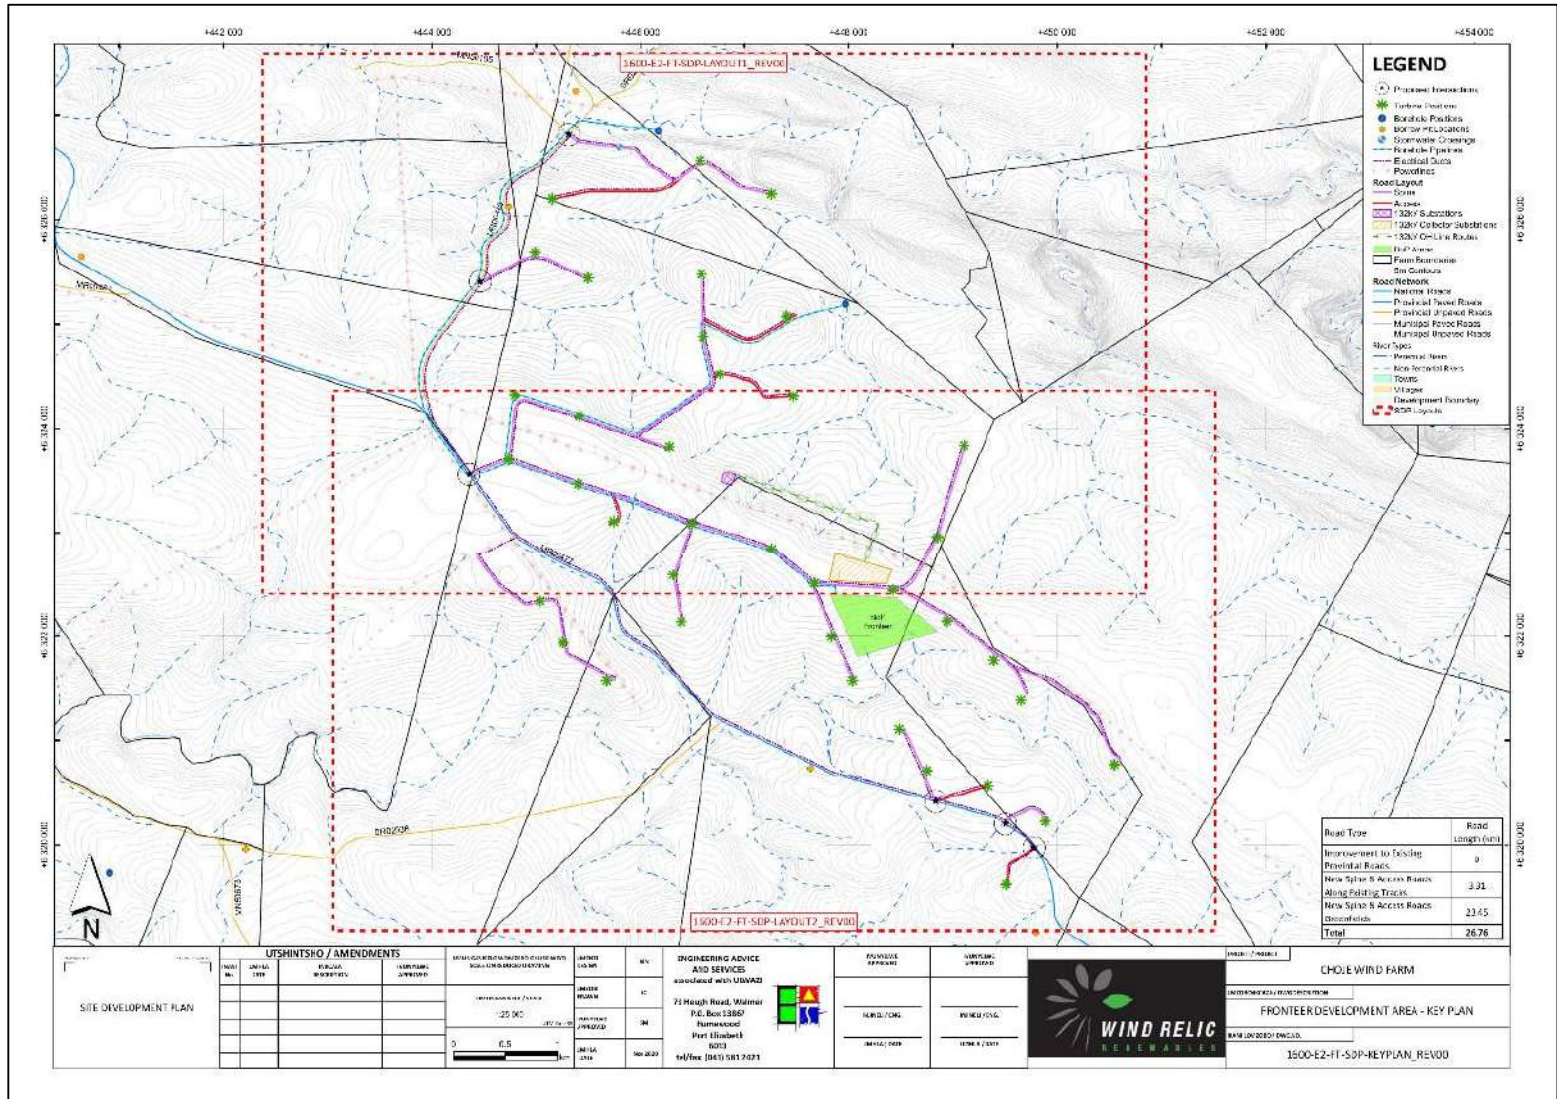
Frontier Wind Farm Site Development Plan (Provided by WindRelic).
